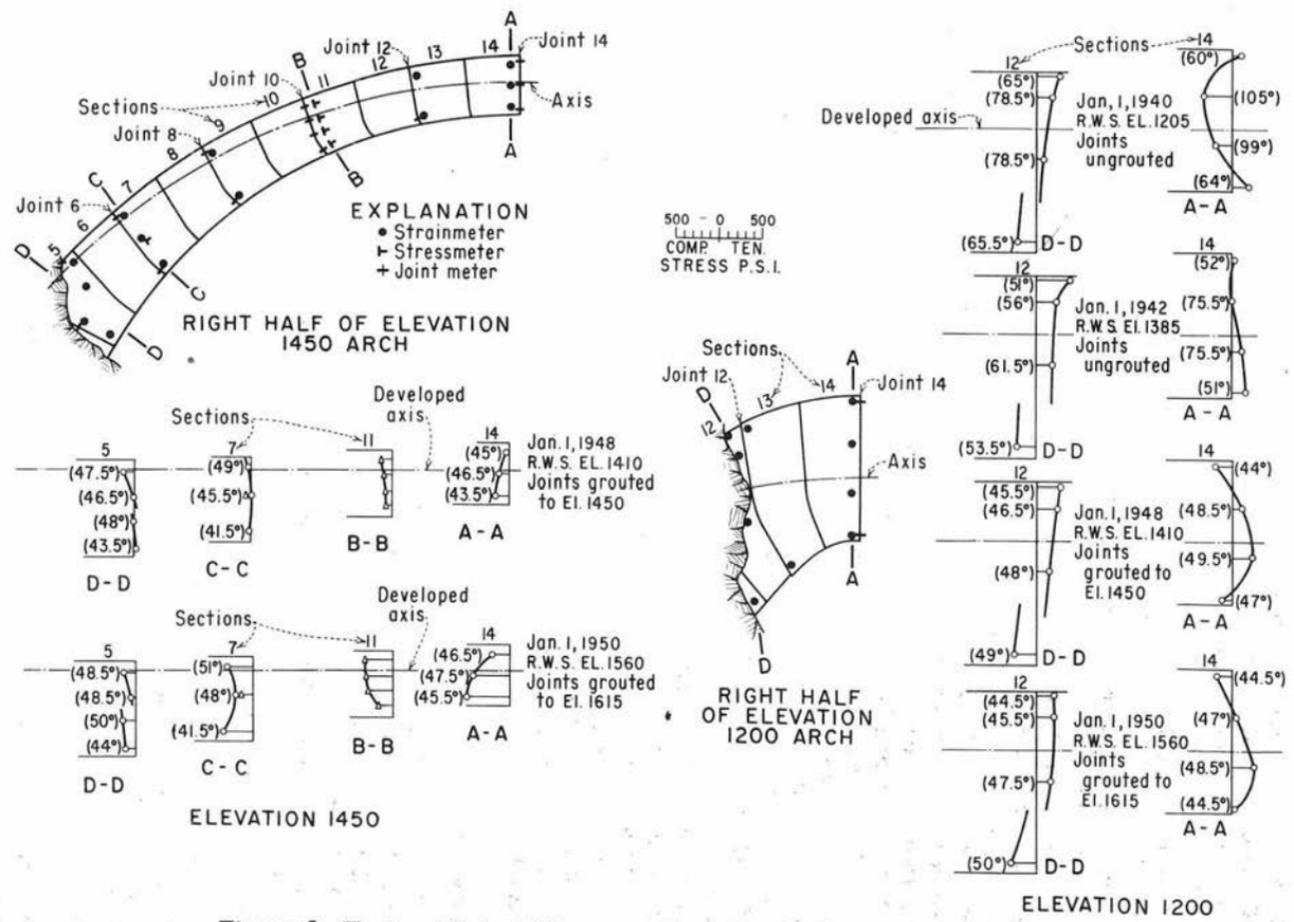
Horizontal Arch Stresses, Elevation 1450 and Elevation 1200.
